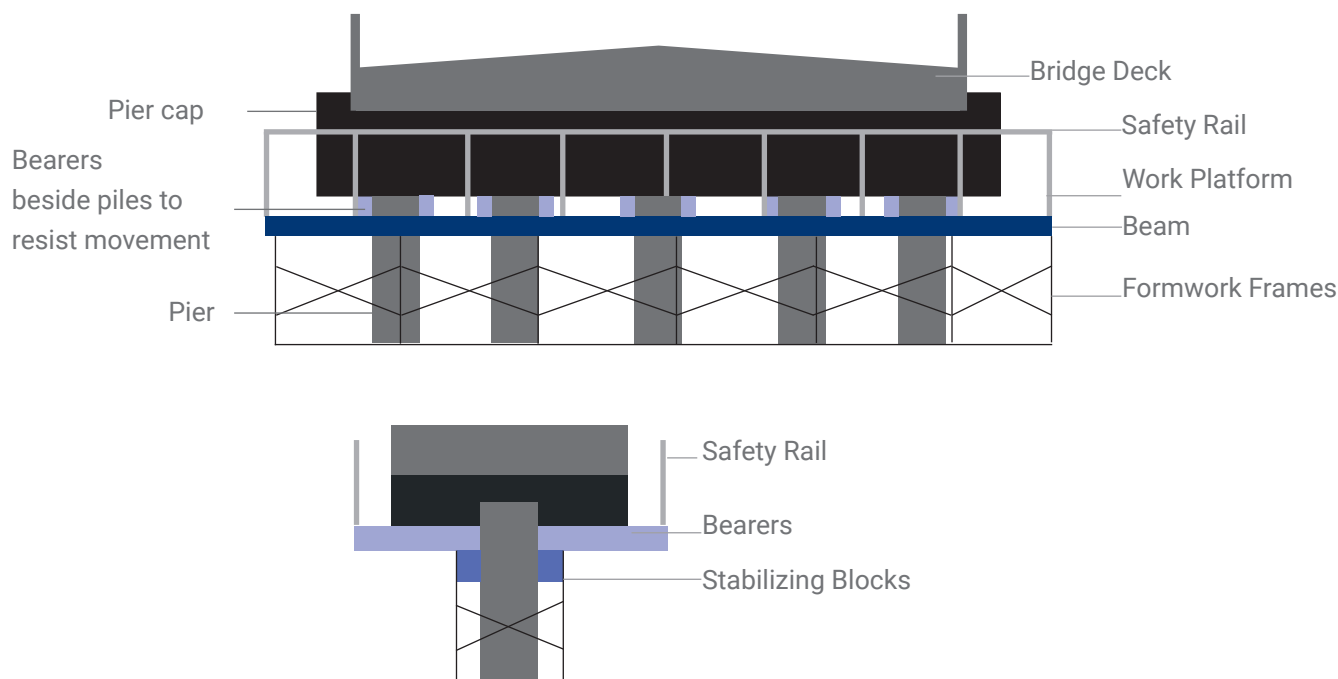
An example of a scaffolding system that can be used on-site during installation.
